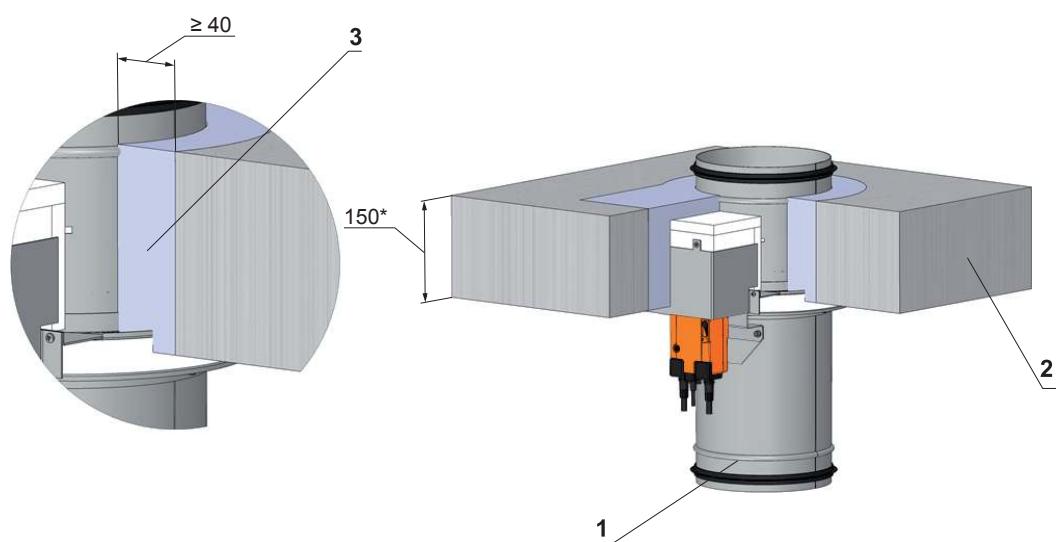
Solid wall construction - stuffing box and fire protection mastic
